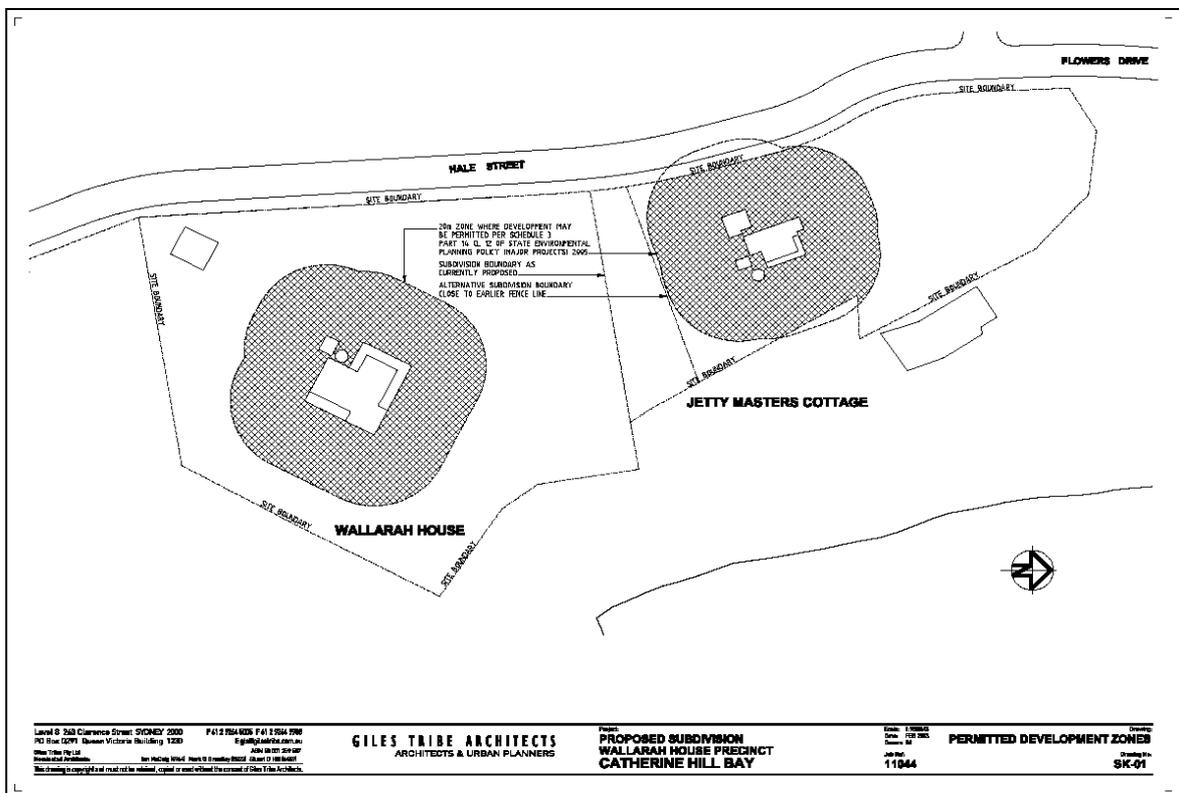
The 20 metre development curtilage referenced in the MD SEPP (Source: Giles Tribe, Architects).
